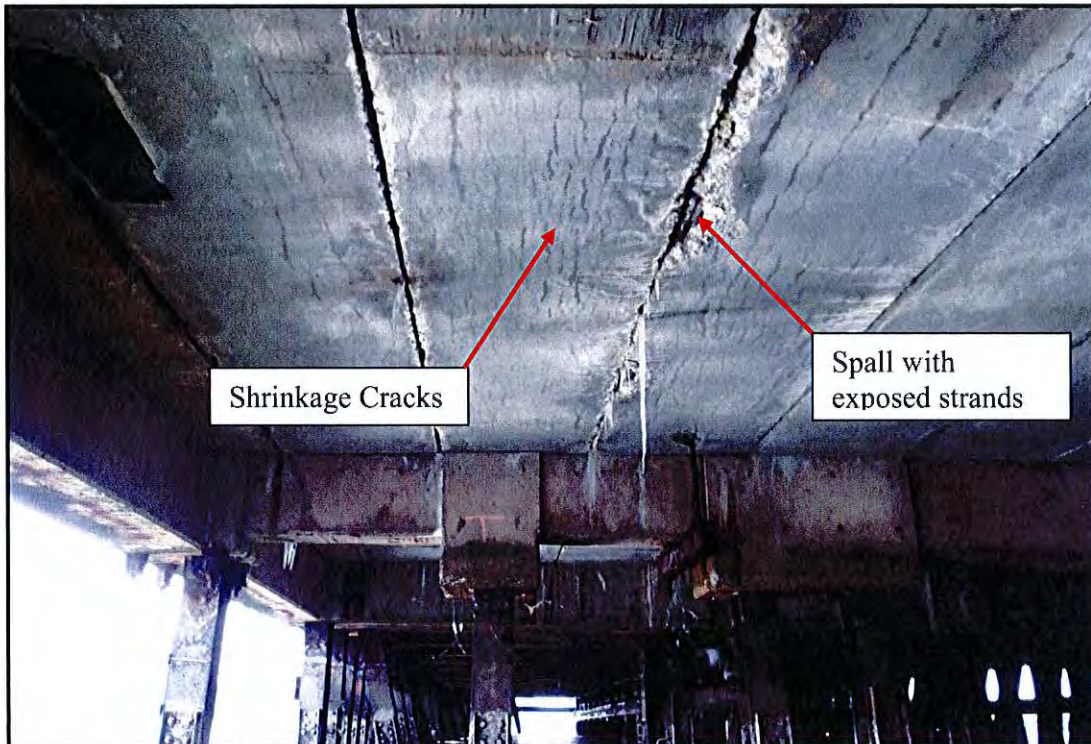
Typical condition of Pier Shed deck soffit with light efflorescence and light shrinkage cracks. Also note the spall in the deck plank with exposed strands.
